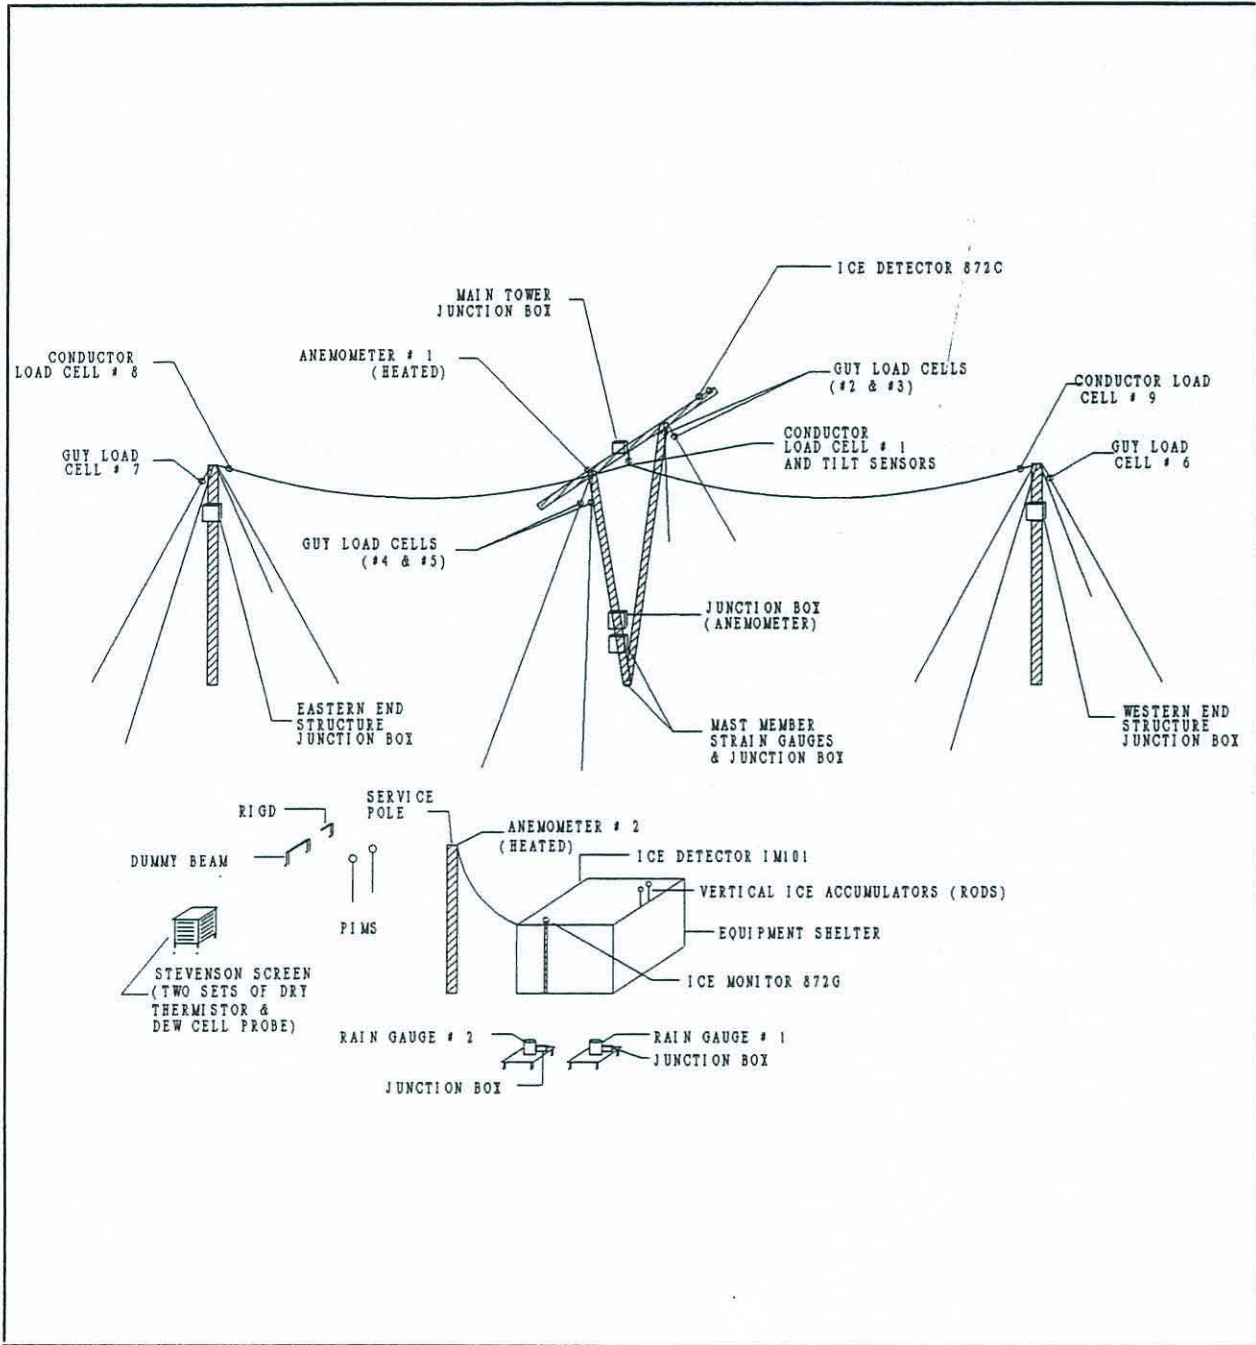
Hawke Hill Test Site - Instrumentation Layout
